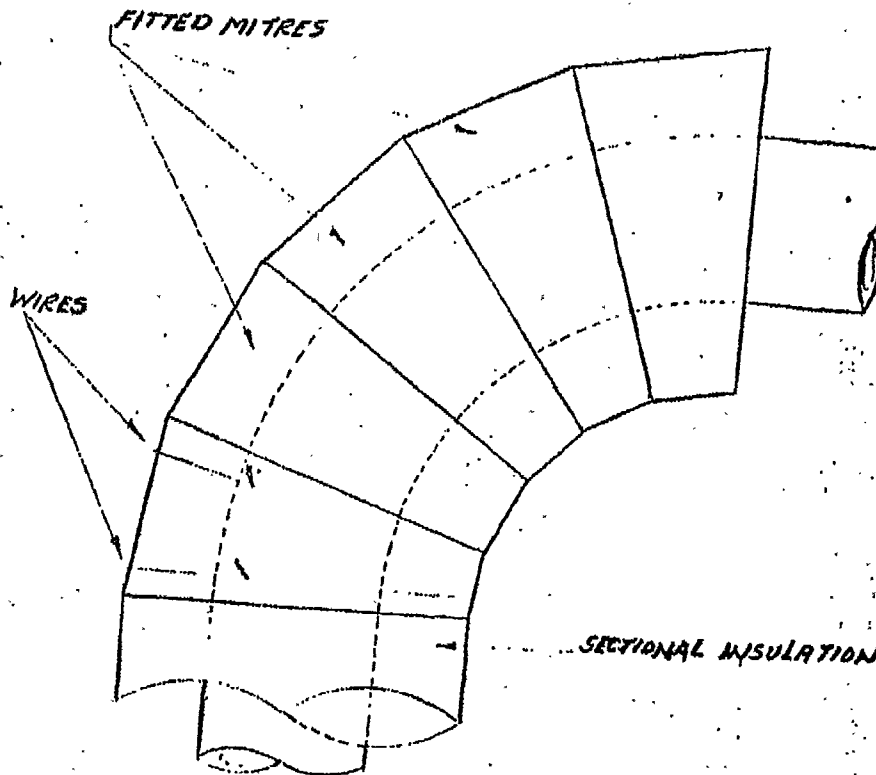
Mitred Insulation on a Weld Ell
